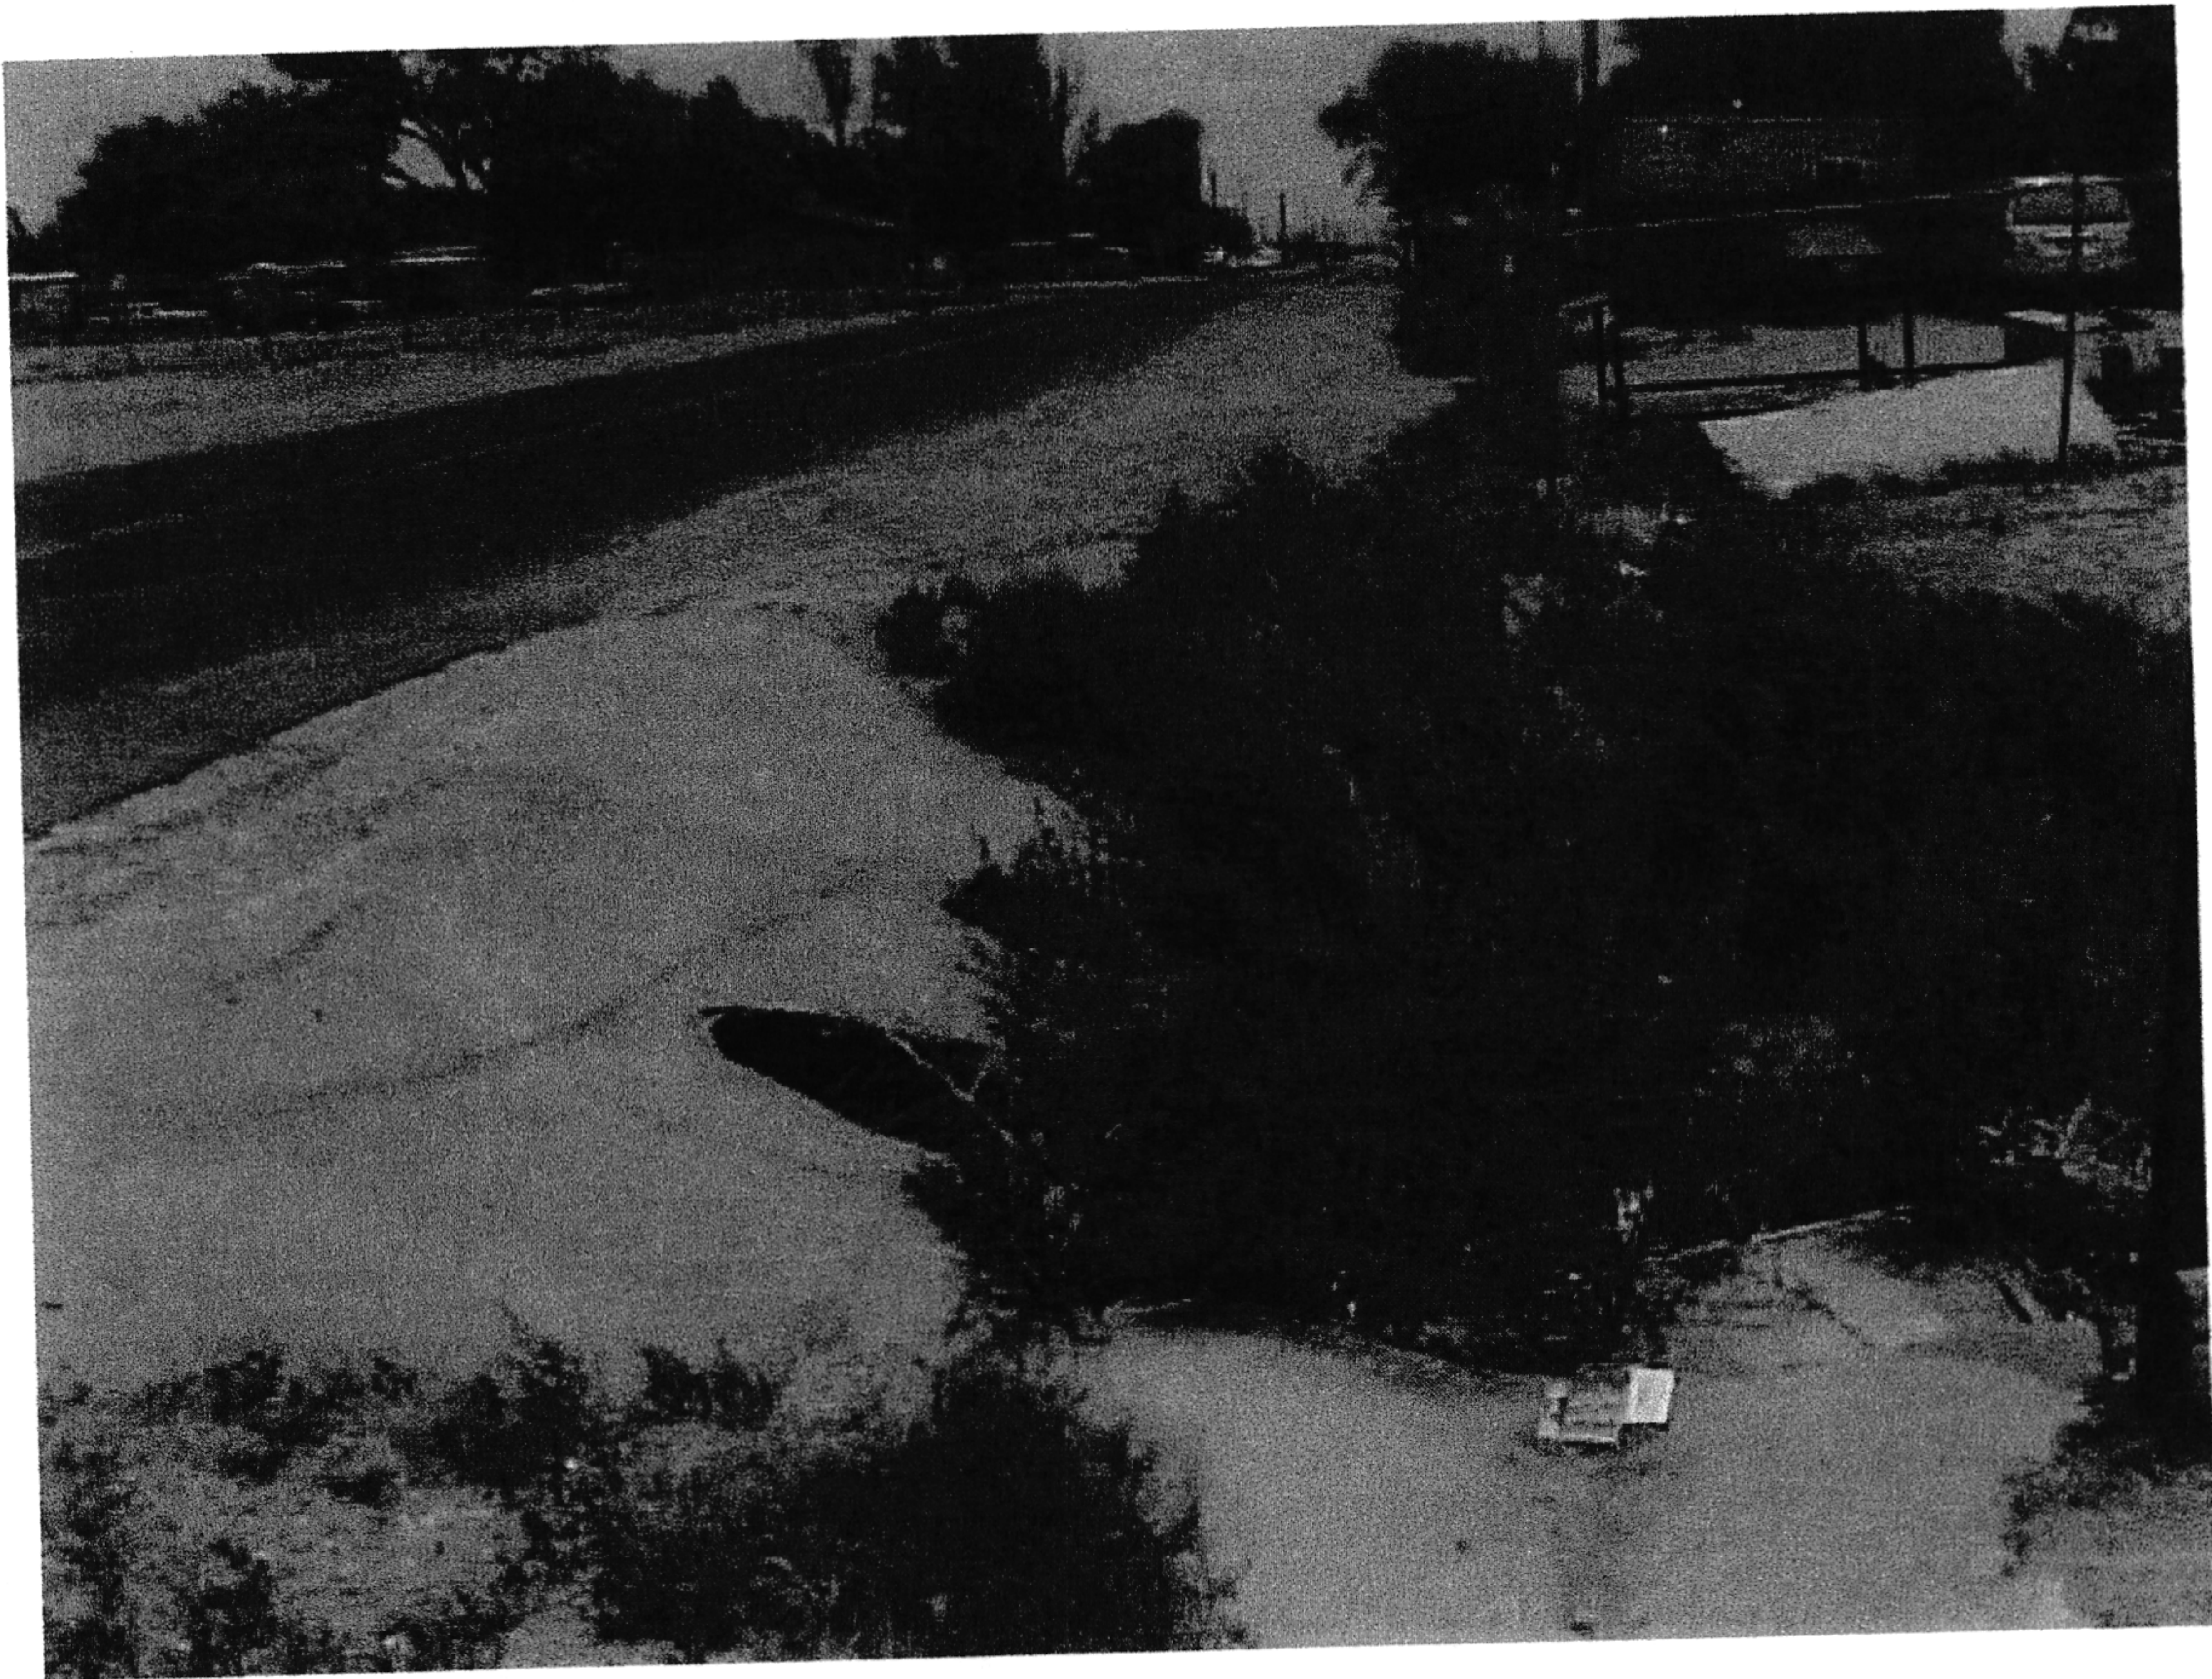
2 – 36" Culverts at San Pedro, East side at Culvert Inlets.
